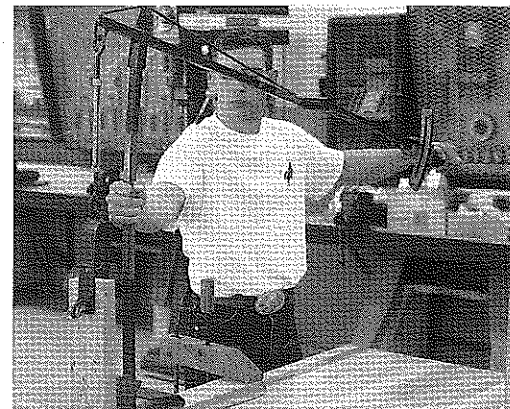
James Perry prepares to apply a destructive load to a wood joint. (Photo courtesy of Glen M. Miller.)
